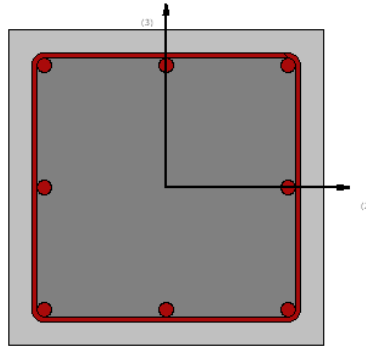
Rectangular Column section 0.35x0.35 (8 No.16) for floor (13, 14, and 15).
